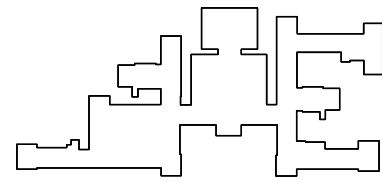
site plan and measurements, own drawing based on our masterplan
